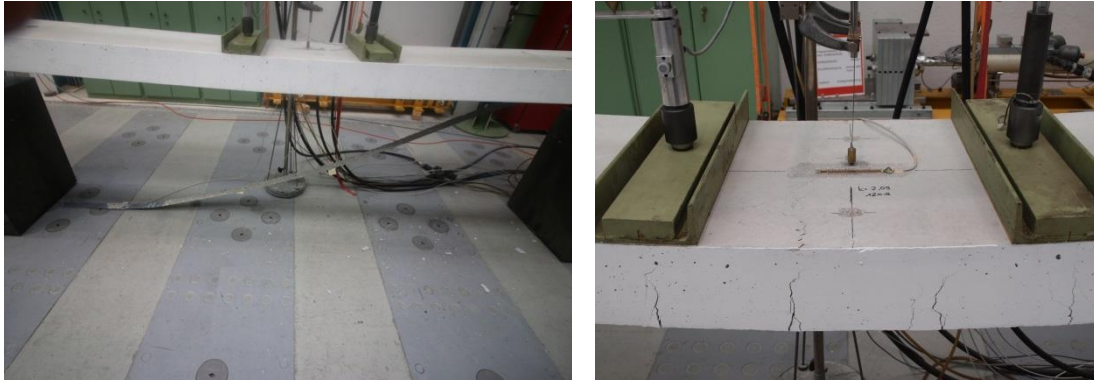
CFRP strip debonding for Beam 2 (left) and concrete crushing for Beams 3 & 4 (right).
